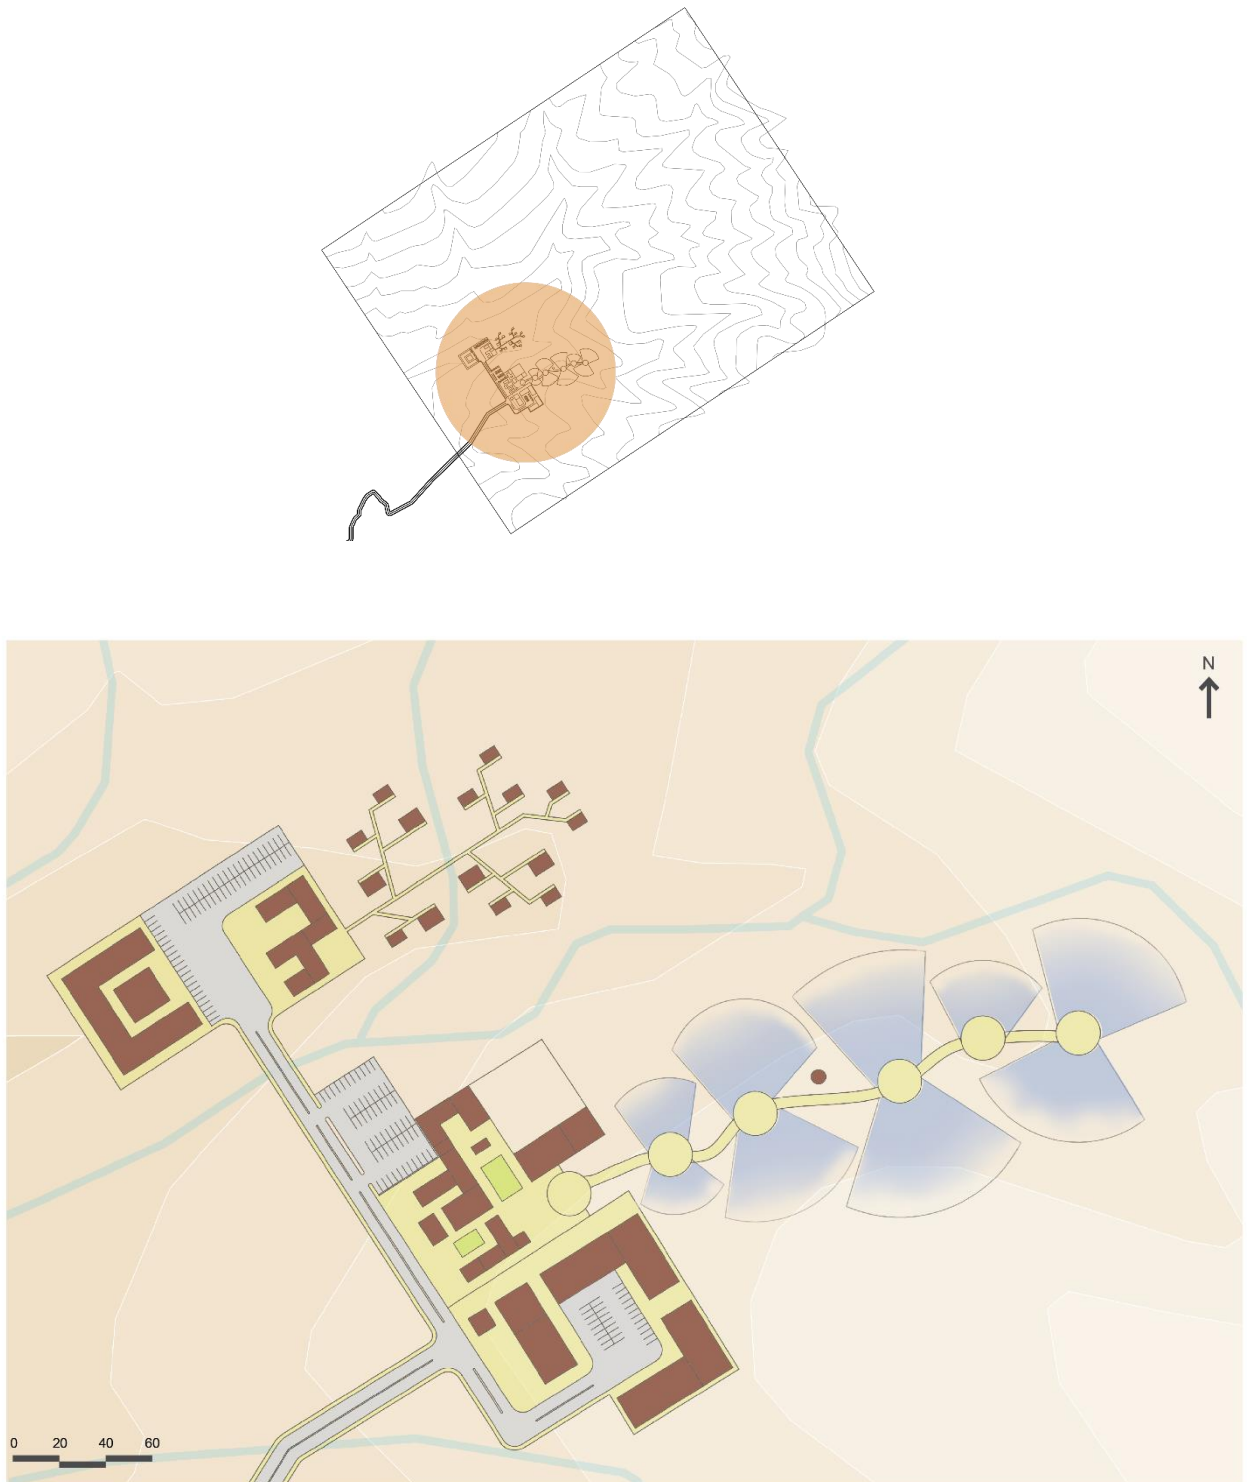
Location of built form on site (top) and Site plan (bottom), (Author)
